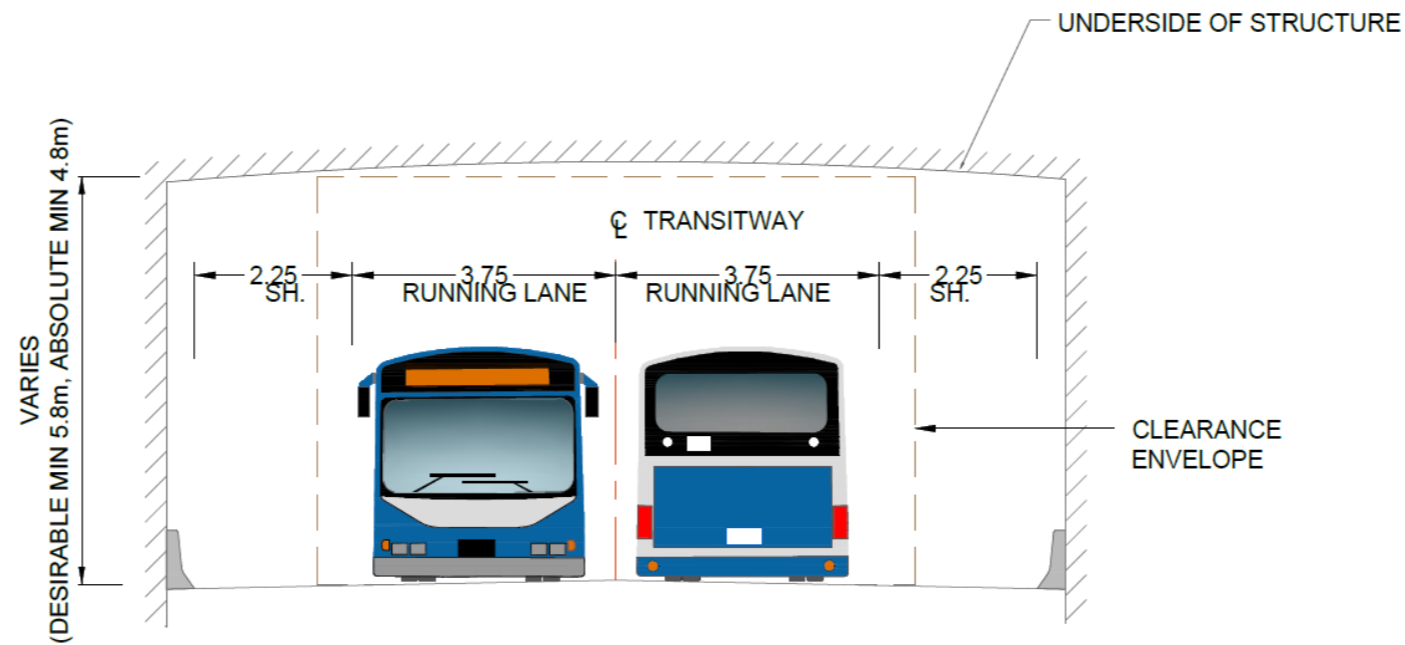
CROSS-SECTION THROUGH TUNNEL SECTION
